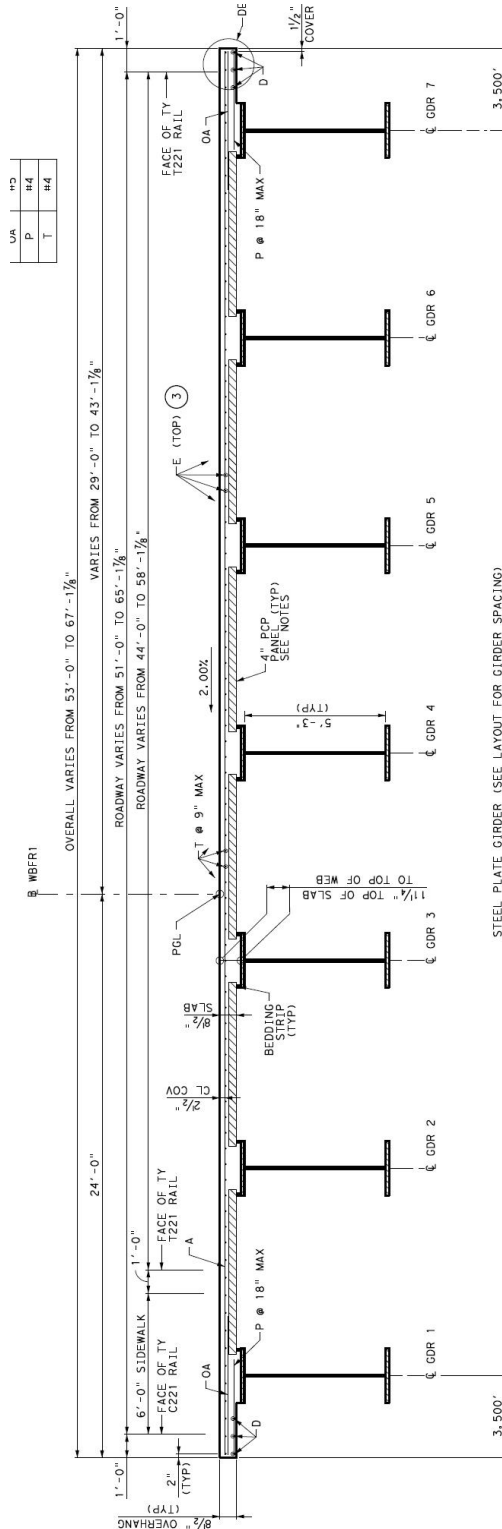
2 Instrumented Cross-section of the Bastrop Bridge
